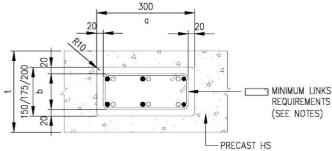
(m) CONNECTION DETAIL AT ELECTRICAL SERVICES LOCATION
